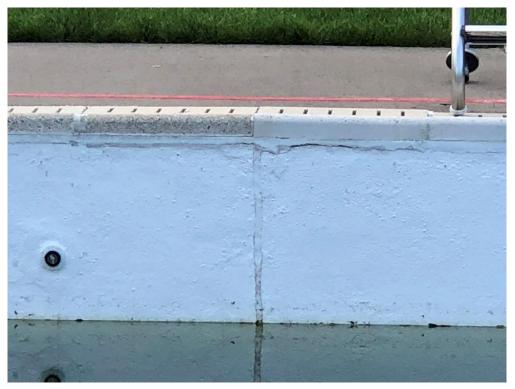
Vertical Construction Joint and Horizontal Crack below Gutter
